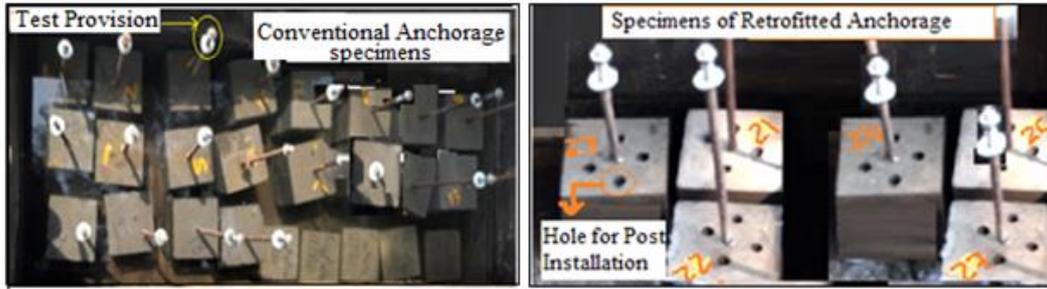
Test specimens of Conventional Anchorage Fig.7b. Test specimens of Retrofitted Anchorage
